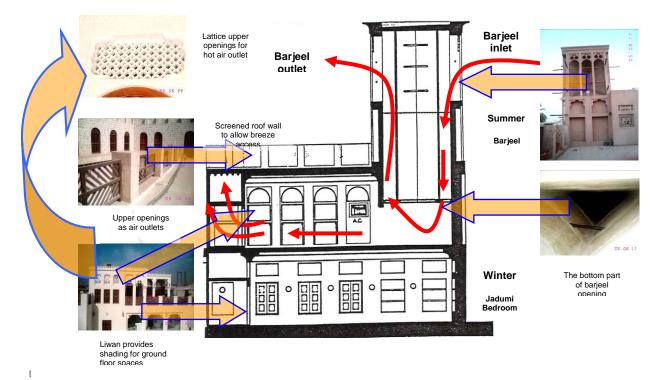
Natural ventilation through upper spaces in a traditional house in the UAE (Source: The author)
